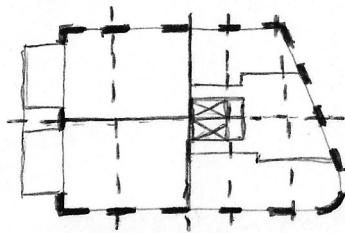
Brasserie Jack-Op, Pieter Vandenhout
